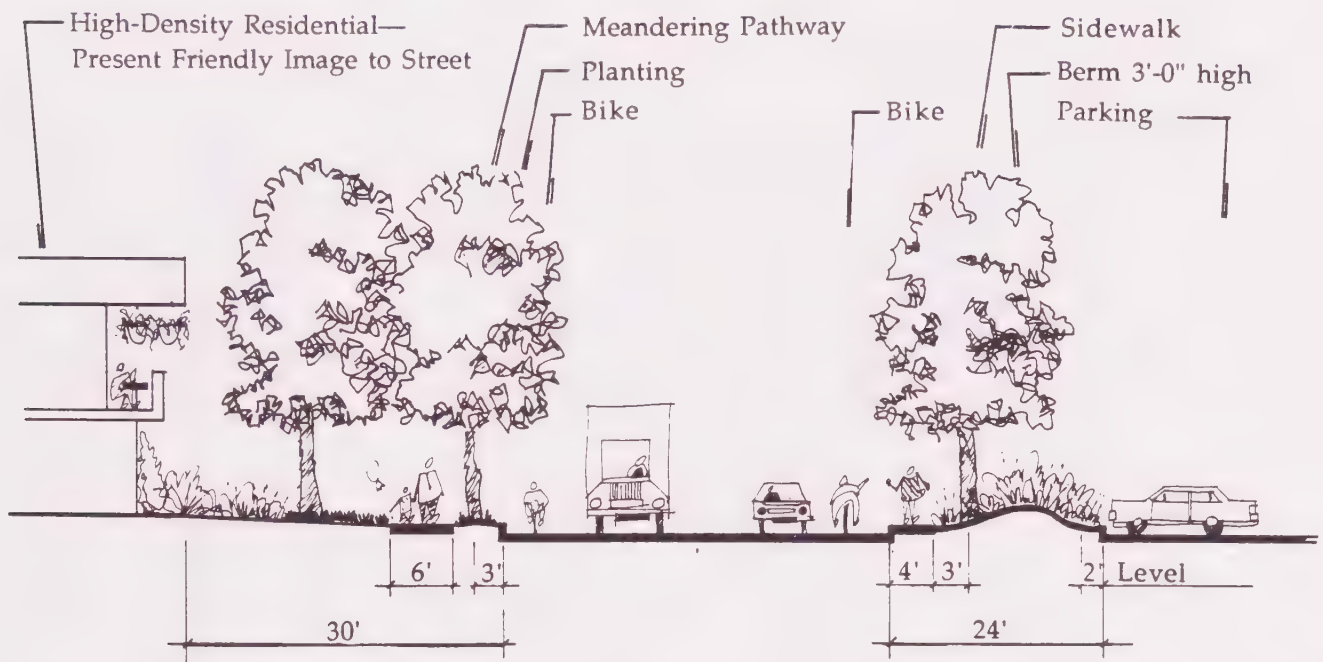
Typical Cross Section at Bell Road looking North (C' - C)
